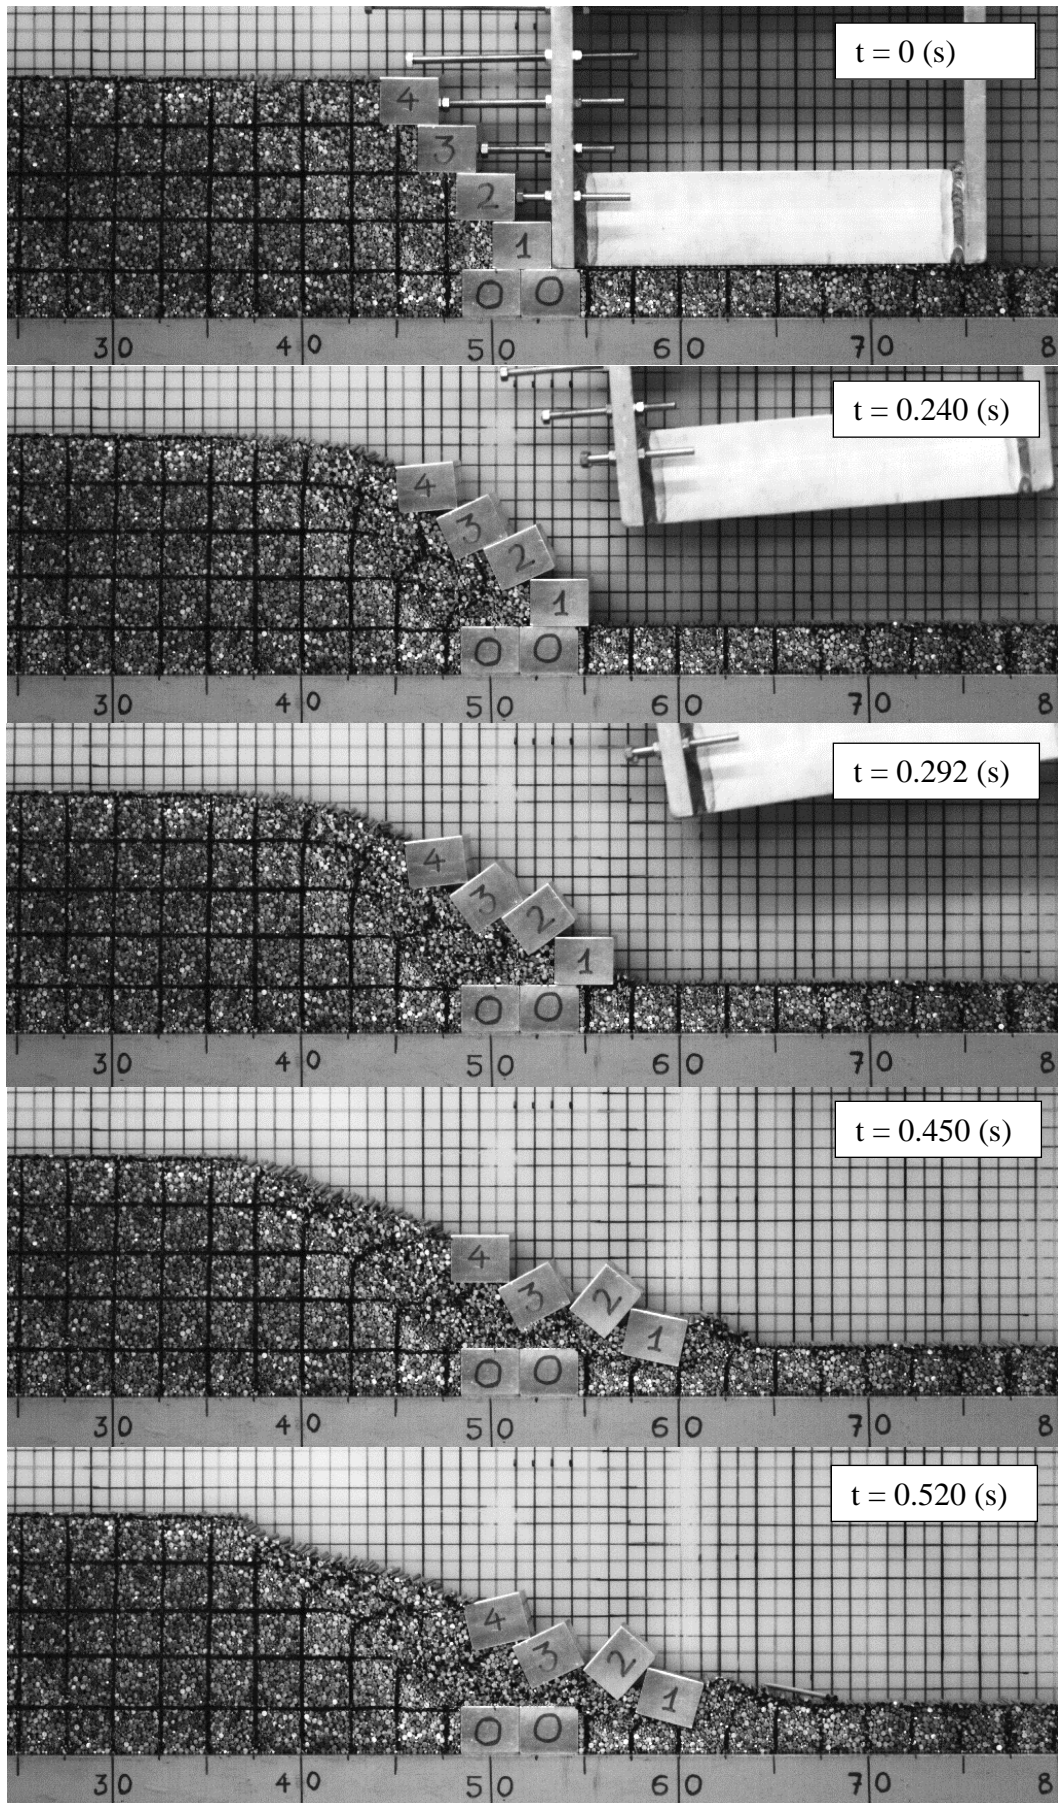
Post-failure behavior of modular-block retaining wall system. Case 1
